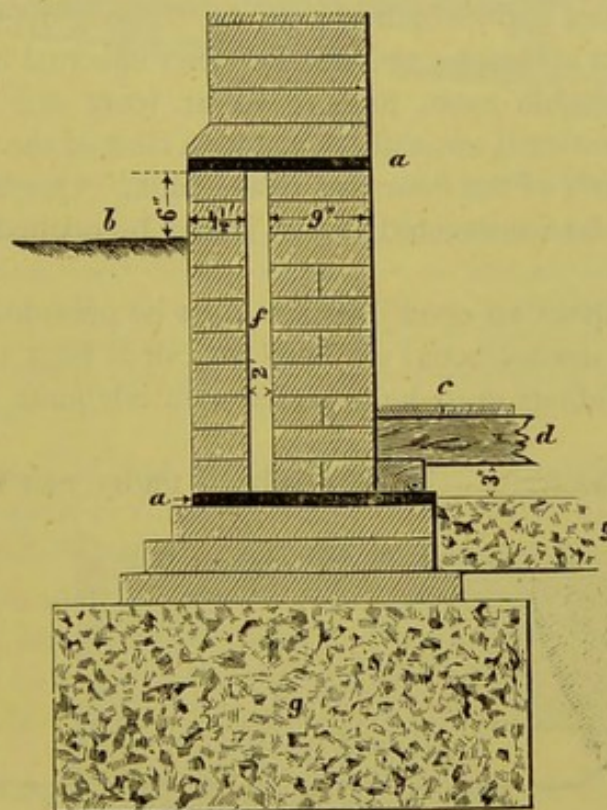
DAMP PROOF AND FOUNDATION OF HOUSE, WITH BASEMENT.
